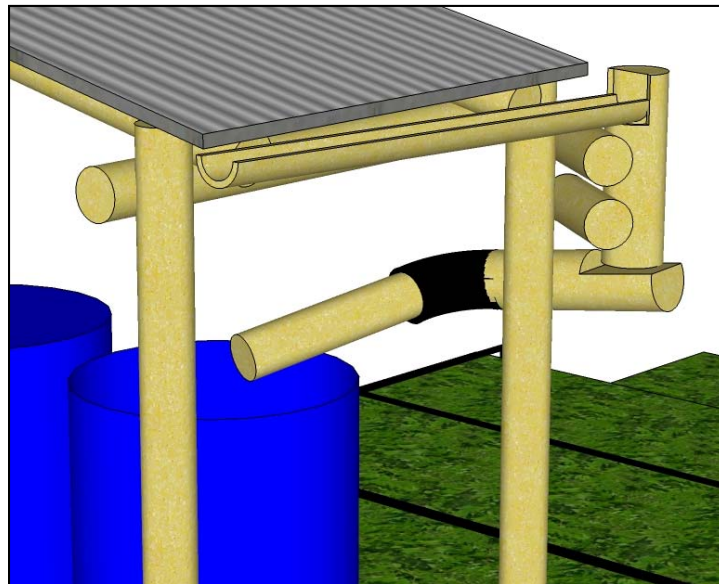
Gutter system design drawing; not shown are the branch supports for the gutter and the wire or lashing required to support the downspouts.
